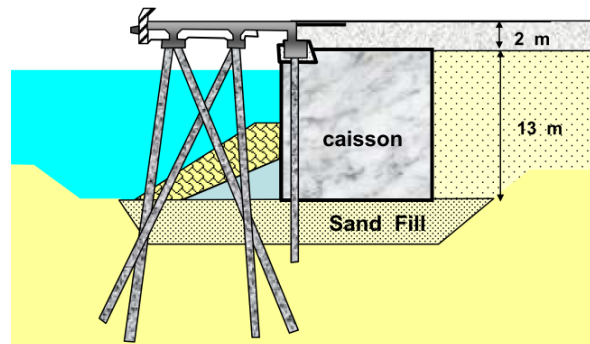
Cross section of survived quay wall in Kobe earthquake, original from Giannakou [9]
